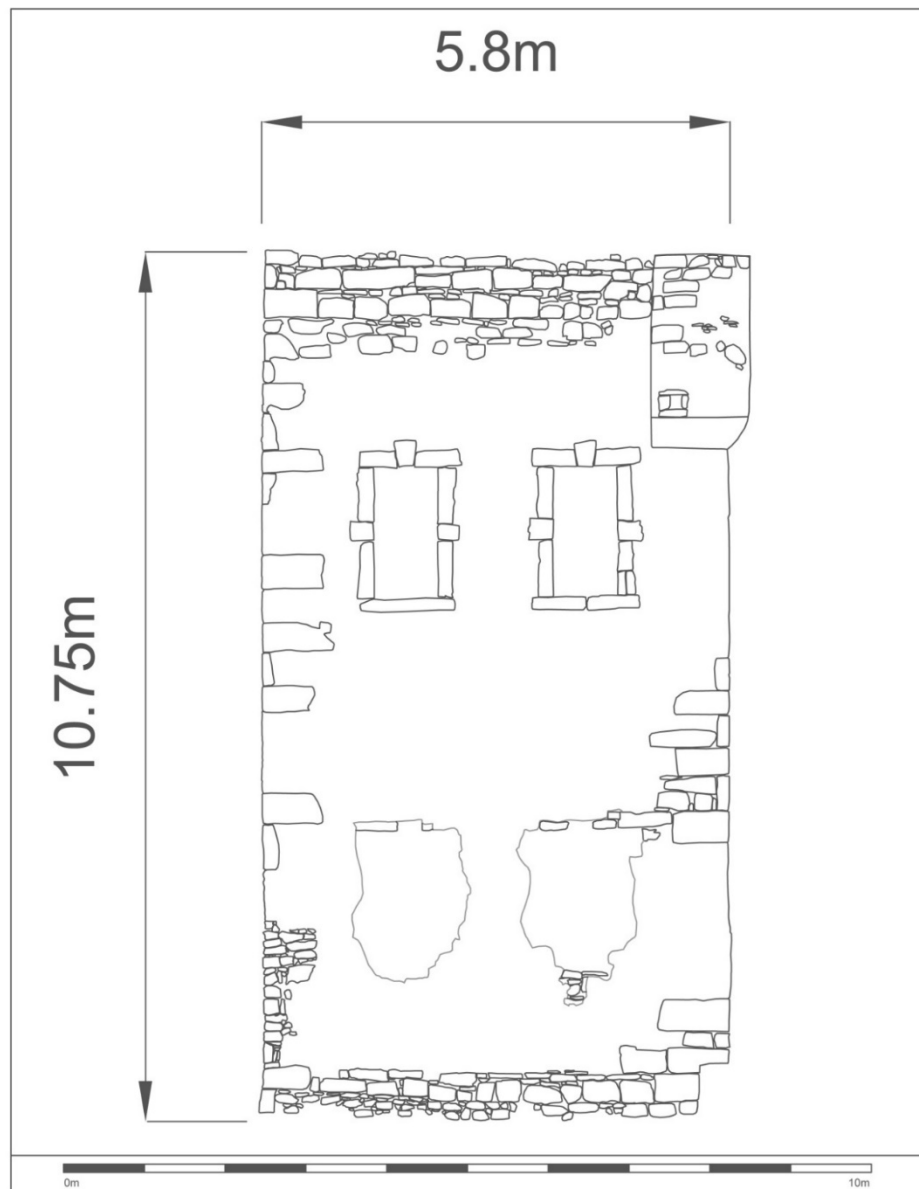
External elevation of the west wall of the signal tower at Rathlee Signal Station.
